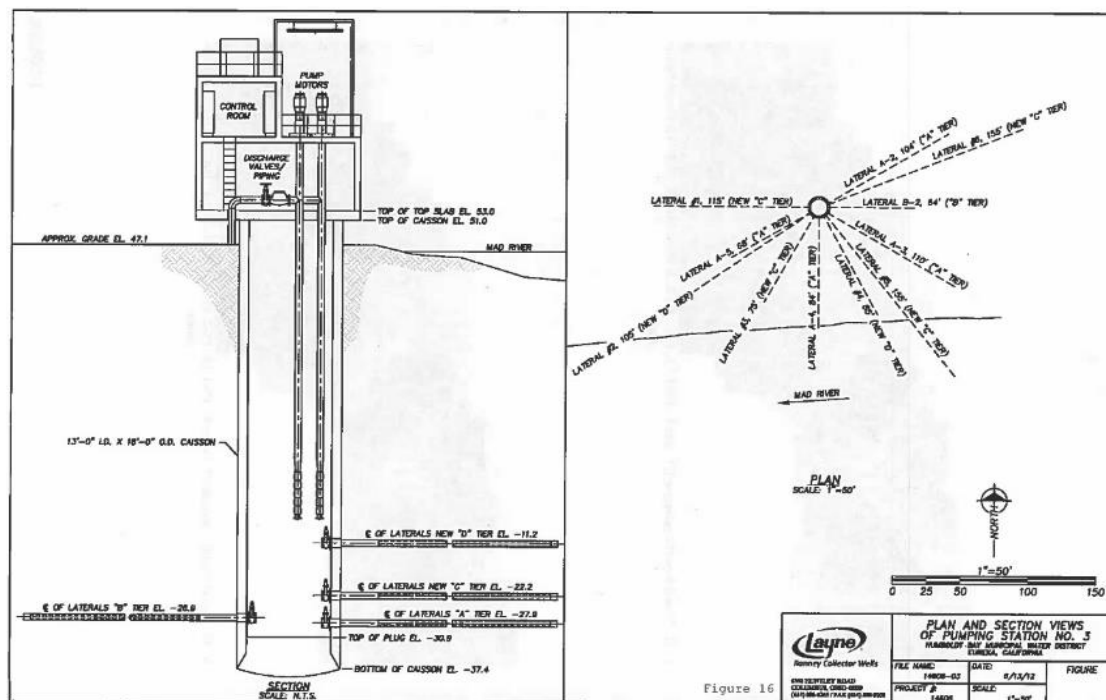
Example Ranney Well Elevation and Plan, Mad River.
